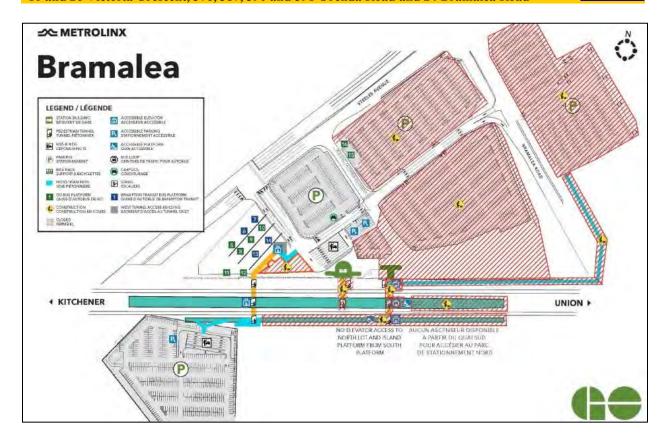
Bramalea Go Station Redevelopment Concept Plan
